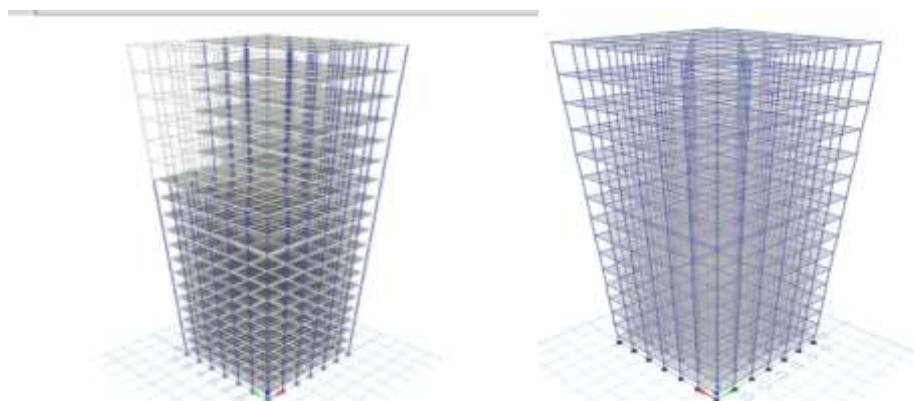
3D and Elevation View of the Structural Model in ETABS
